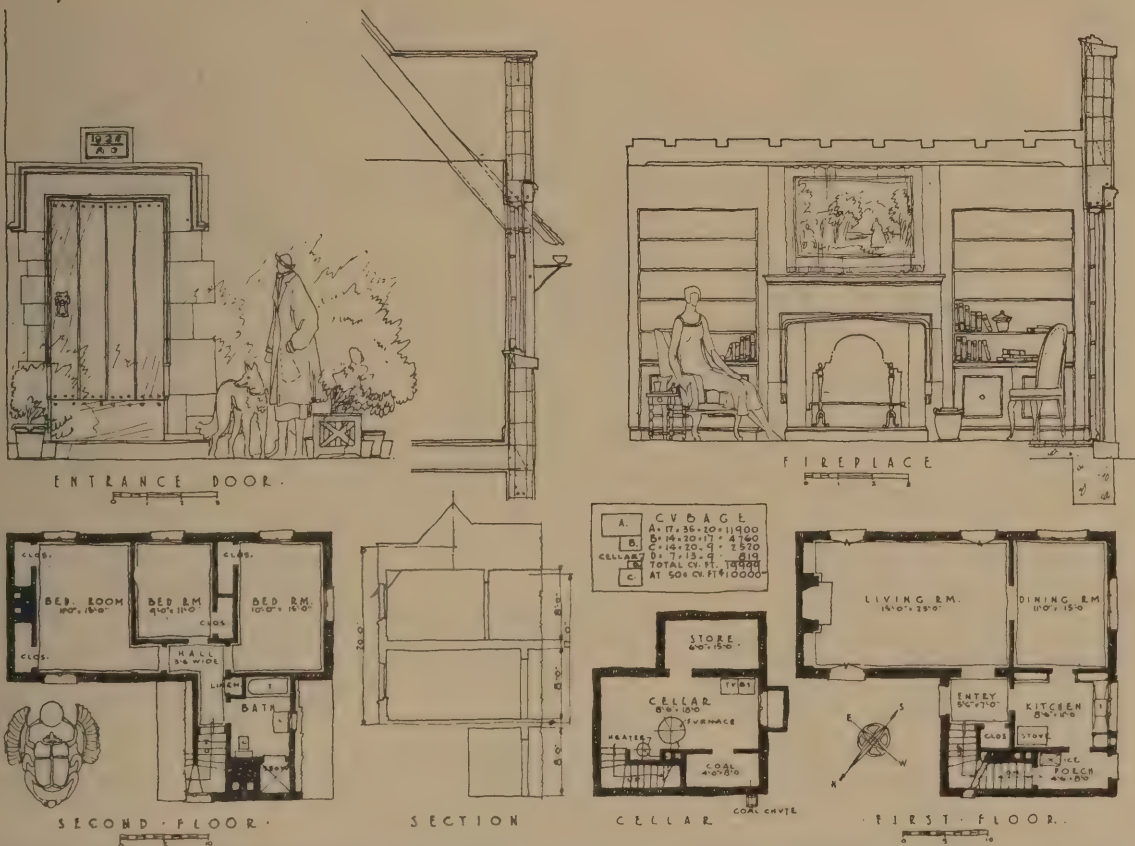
B, G. Dewey Swan, c/o H. T. Lindeberg, 2 West 47th Street, New York.
